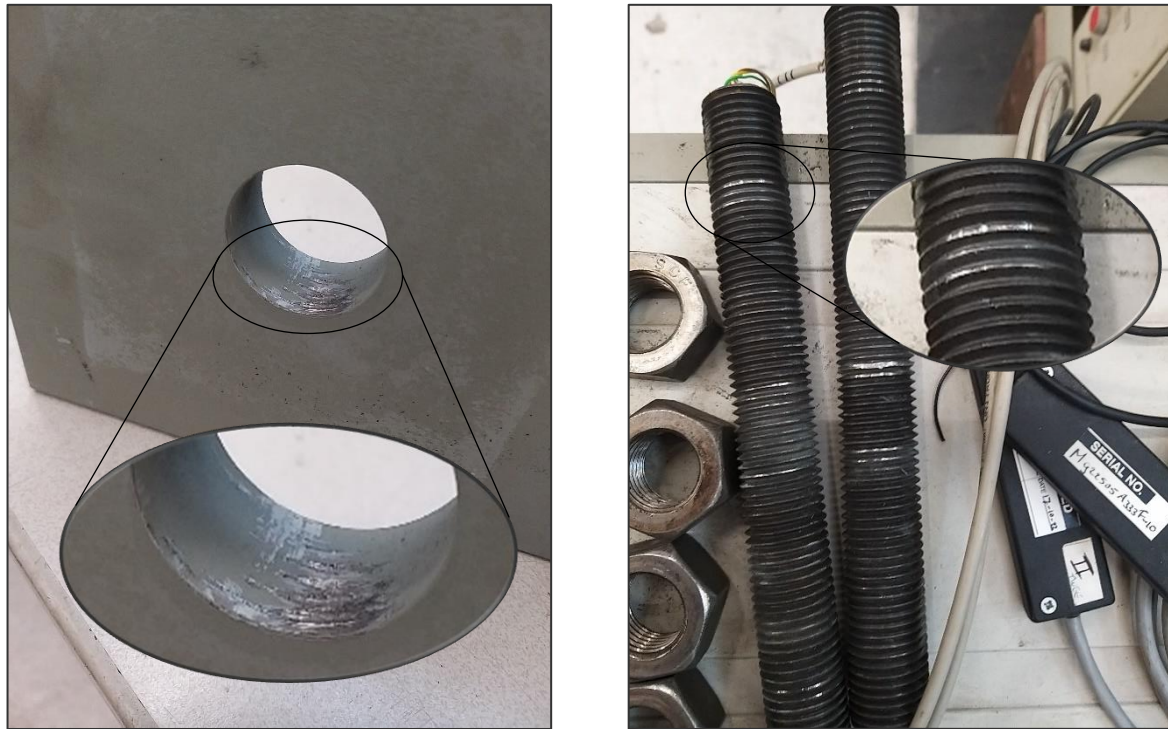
Damage to plates (Left) and bolt rods (right) due to interaction
